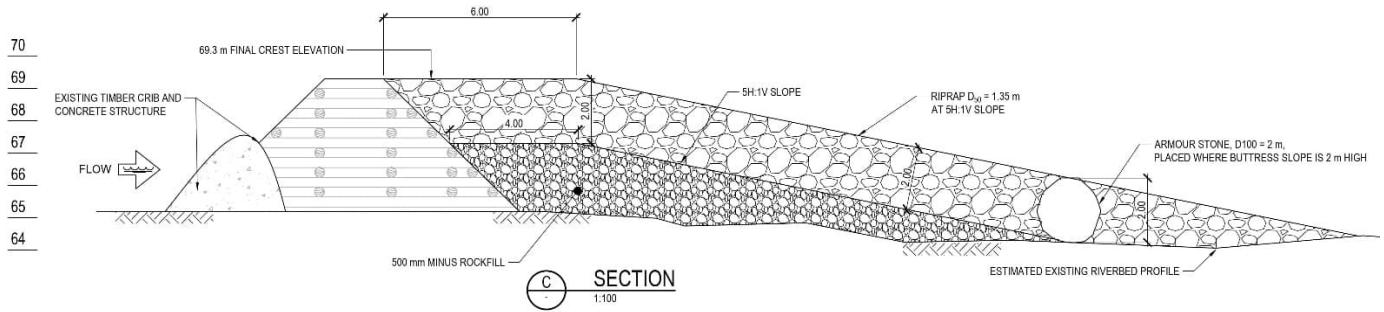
Typical Cross Section for Proposed Reinforcement
